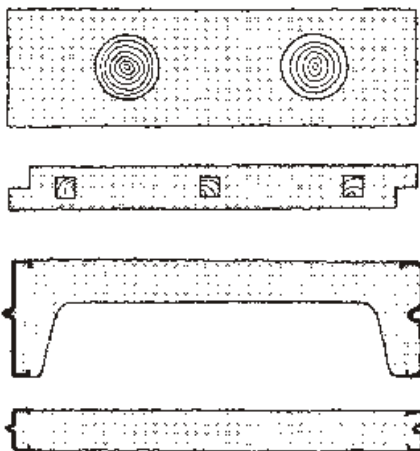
Cross section of slabs reinforced with wood (above) and galvanized steel channels (below).
